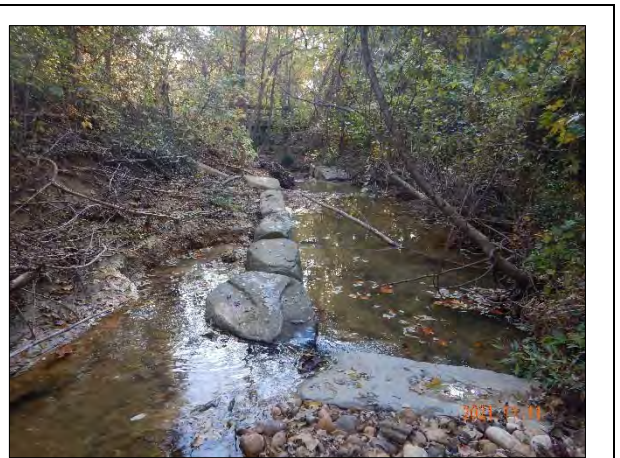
Cross-Vane #3 – Looking Downstream (Station 5+80)
